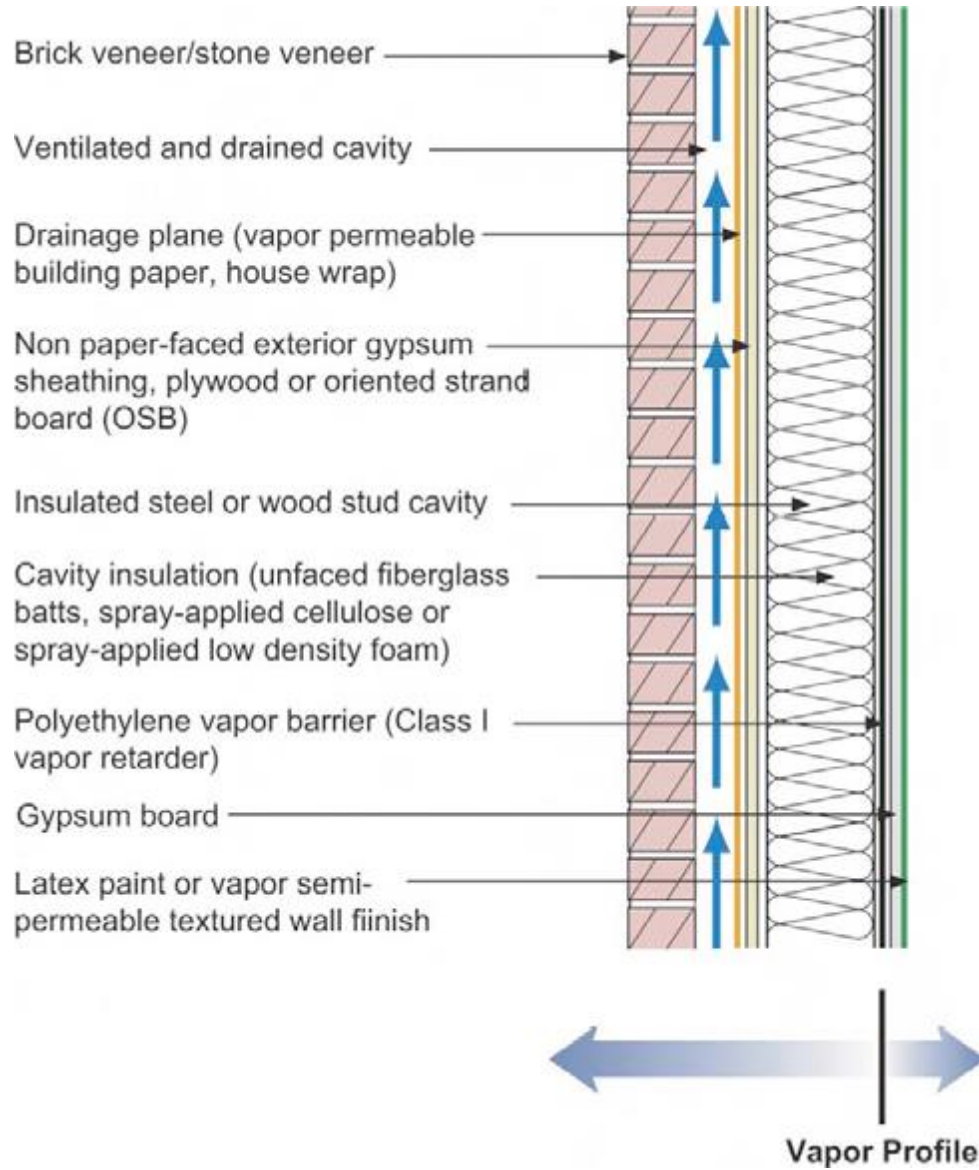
Frame Wall with Cavity Insulation and Brick or Stone Veneer With Interior Vapor (Joseph, 2005)
